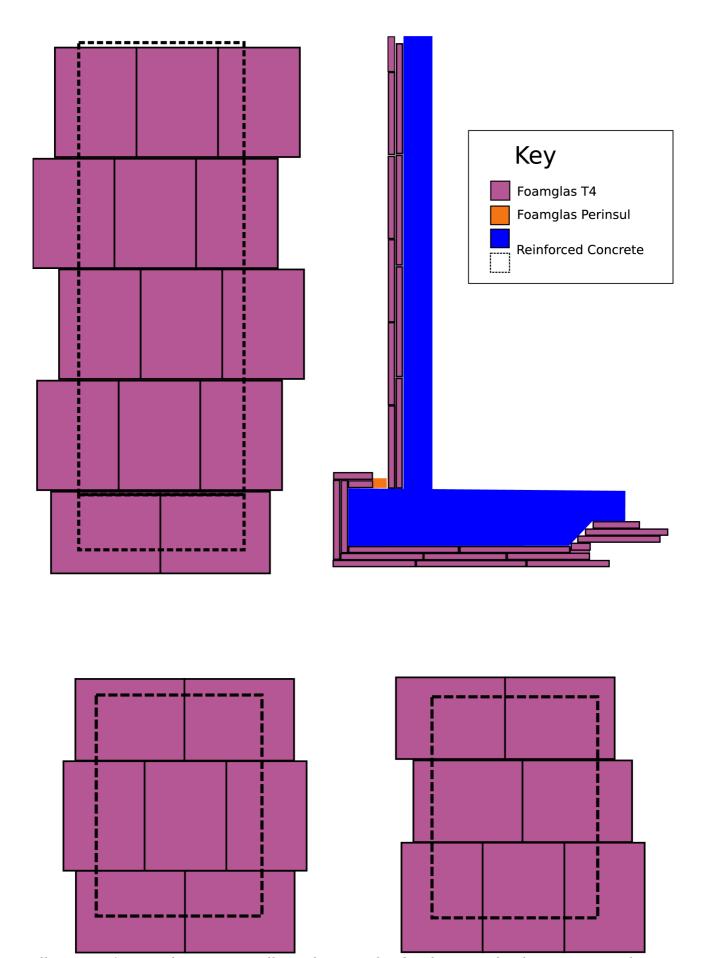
Typical Retaining Wall Panel - Foamglas details. Top Left: Elevation on panel; Top Right: Section; Bottom: Two example layers rage /
